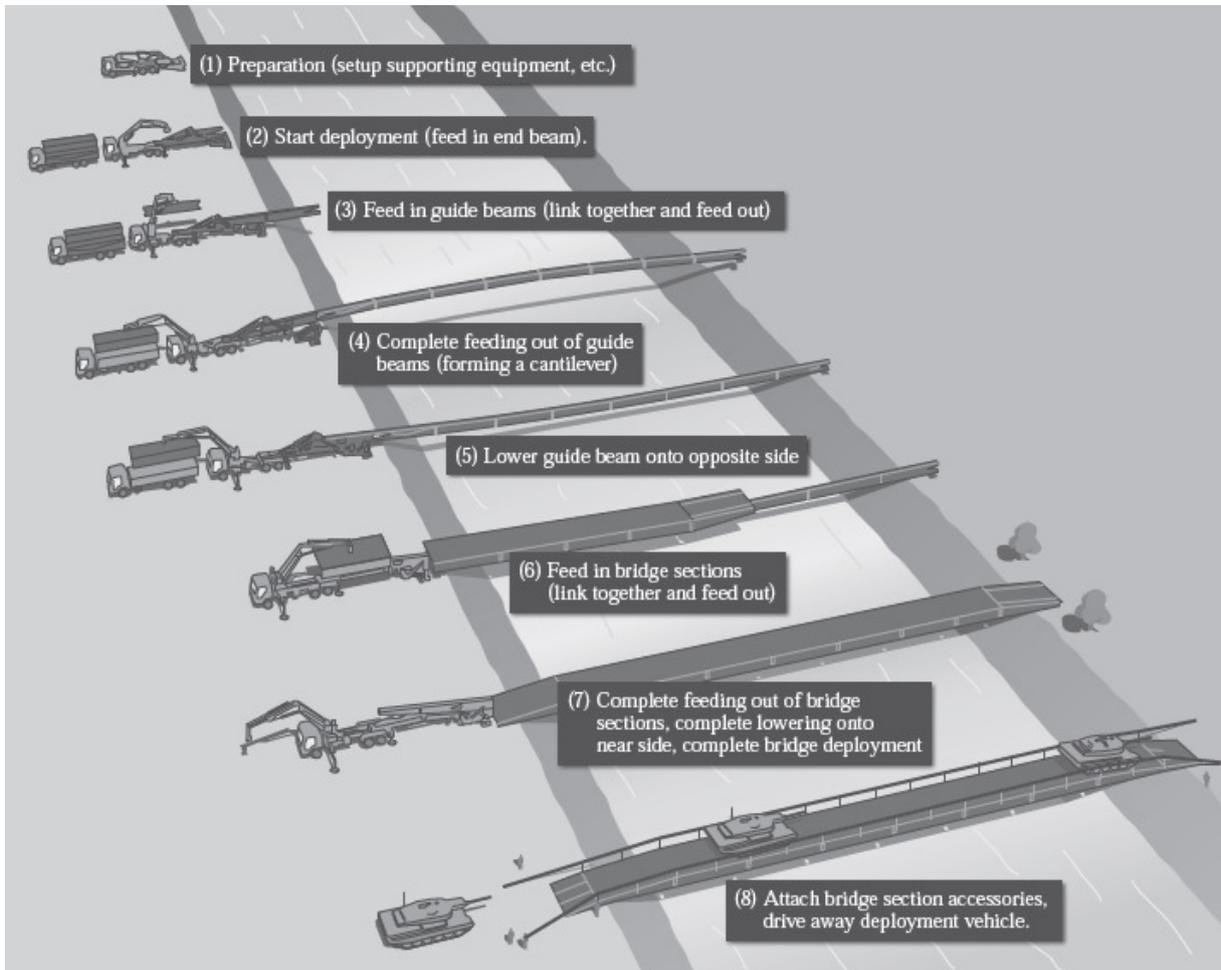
Launching of the Type 07 bridge over an obstacle [7]
